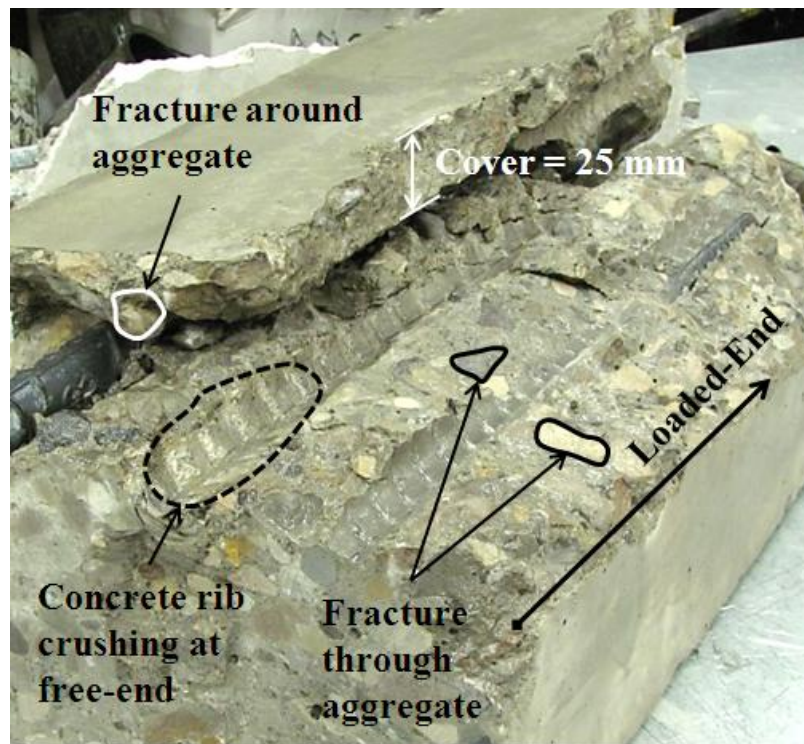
Main failure planes through concrete cover (dissected BE-NAC-40-450A)
